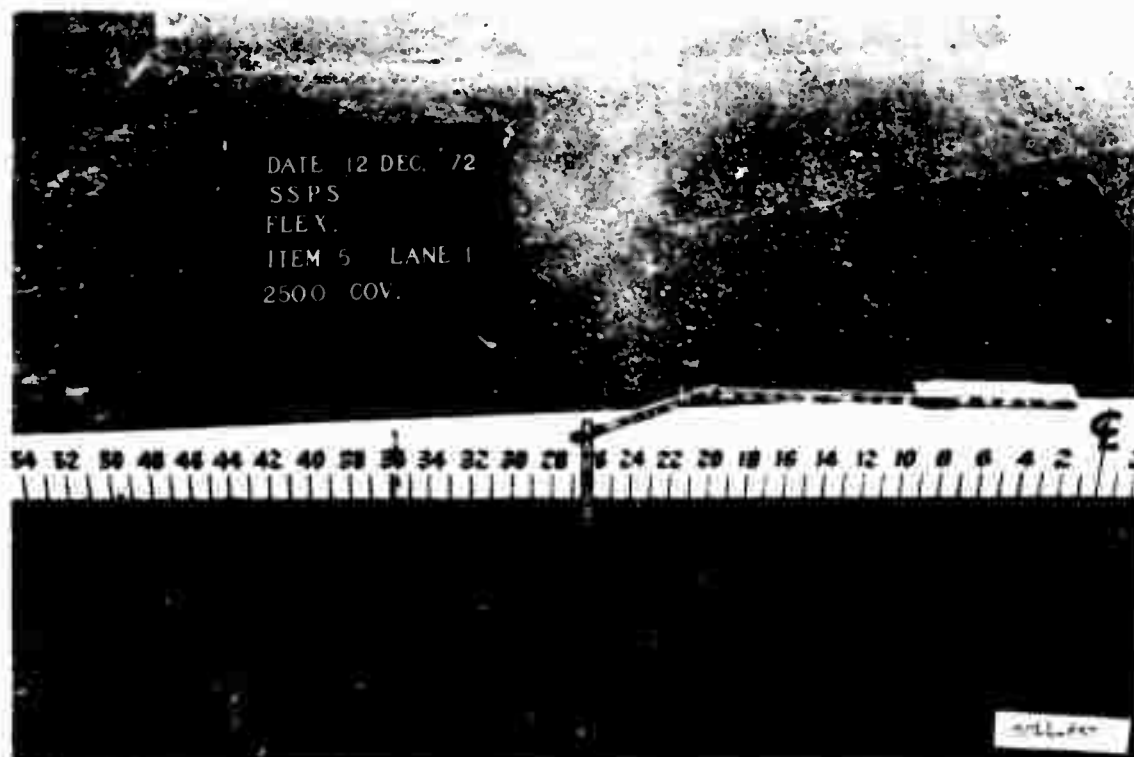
Item 5, lane 1, flexible pavement test section, at 2500 coverages of 200-kip twin-tandem assembly
